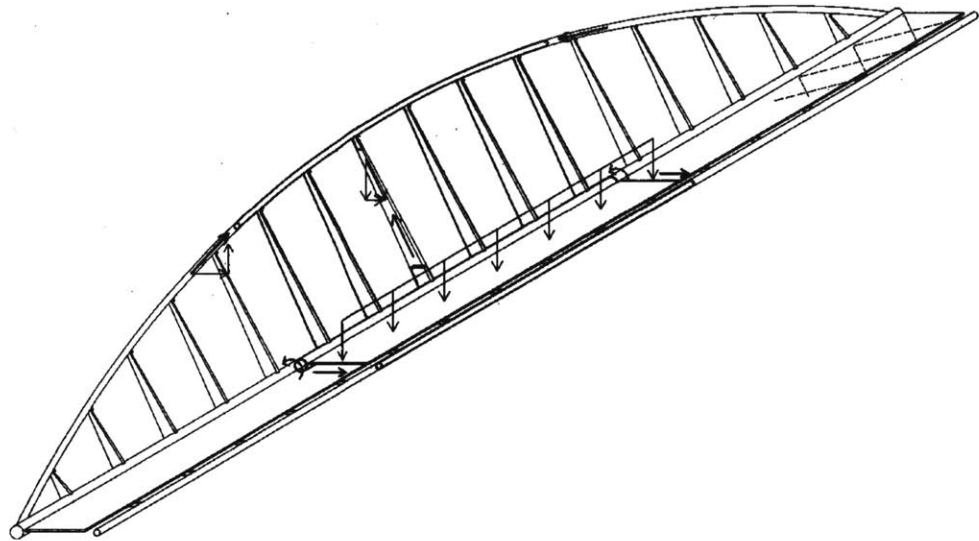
Project view explaining the global stability of the La Devesa Footbridge
